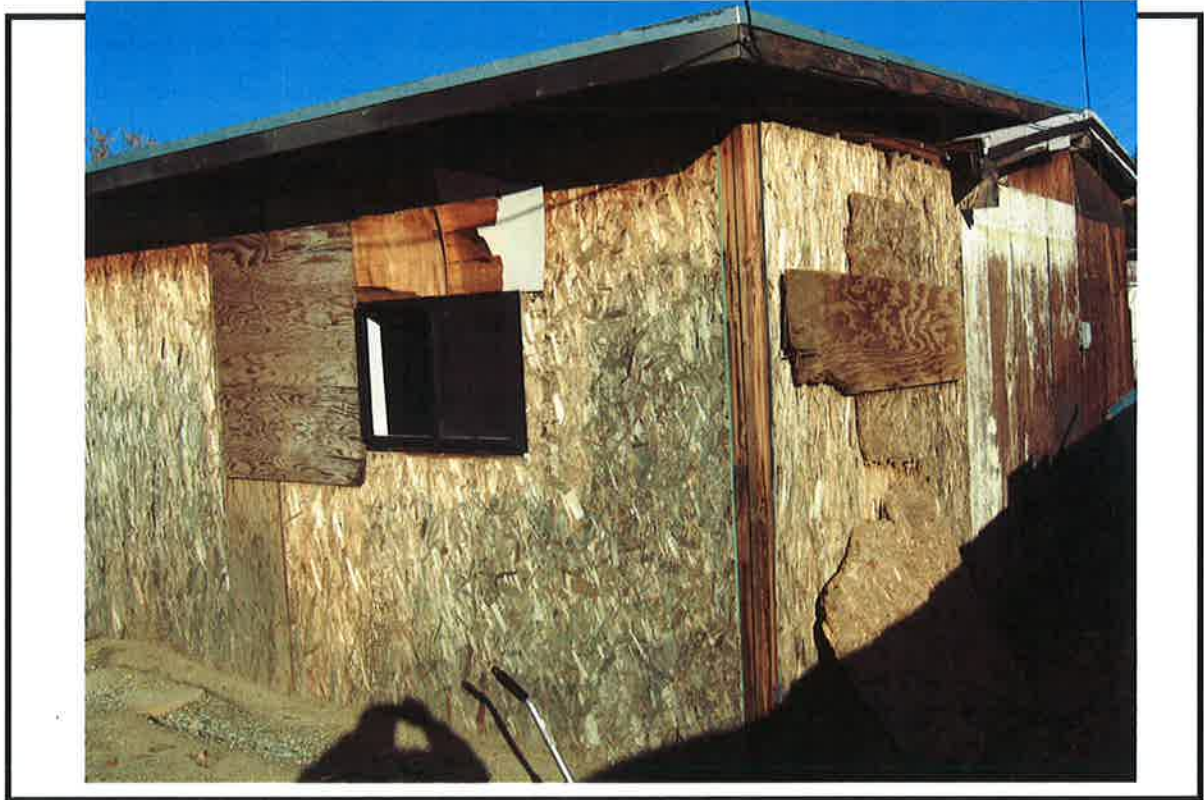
DATE: 01/08/08 TAKEN BY: A Green#69 NOTES: plywood no insulation
